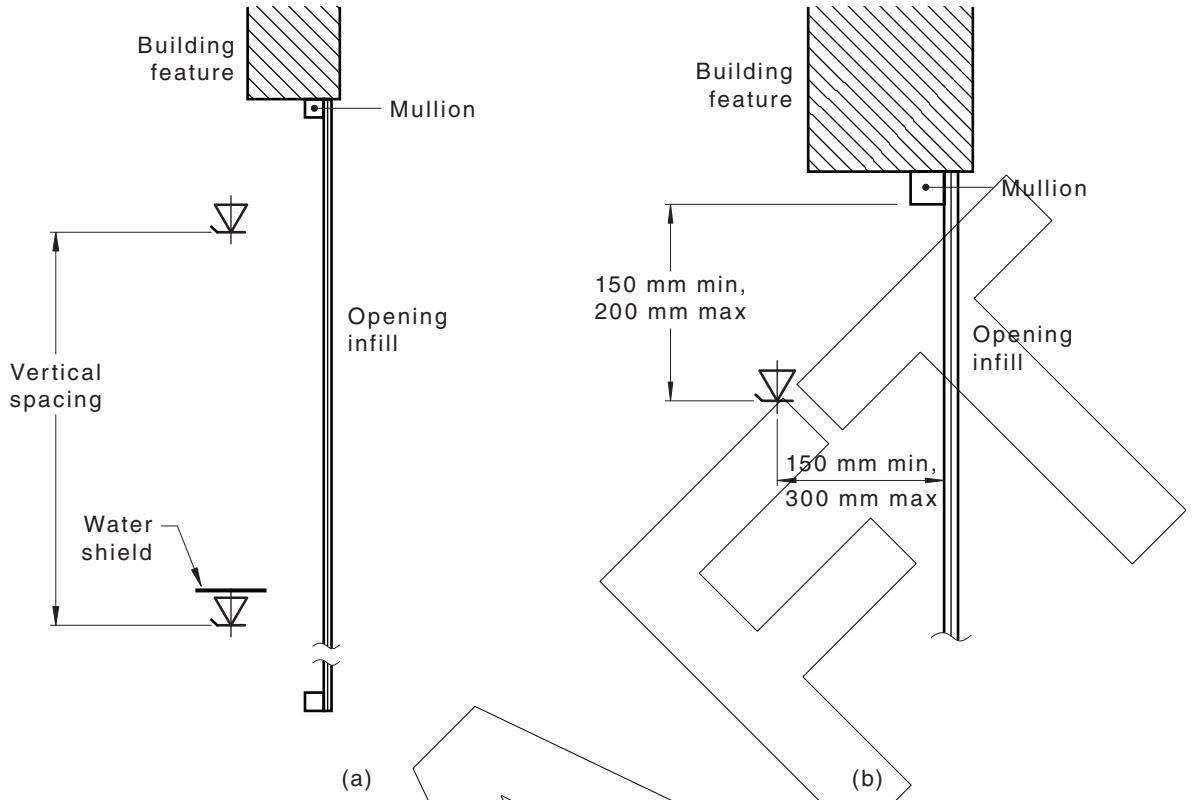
Orientation and location of sprinklers for glazing or infill opening
